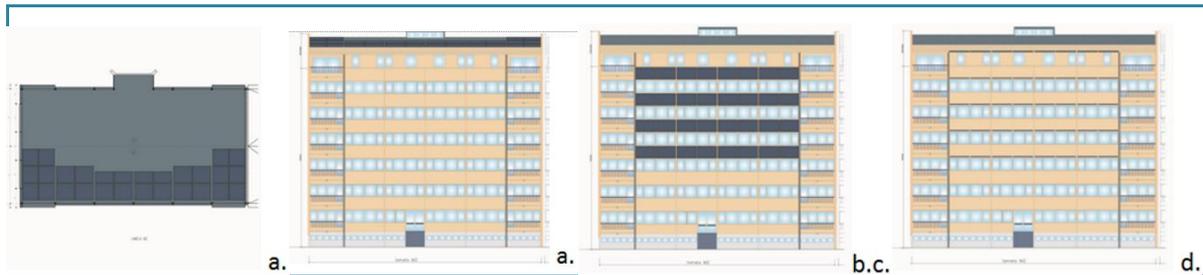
(a) I Design Variant: roof 40° (roof and facade layouts), (b) II Design Variant: parapet 90°, (c) III Design Variant: parapet 45° and (d) IV Design Variant: sun shading 0°
